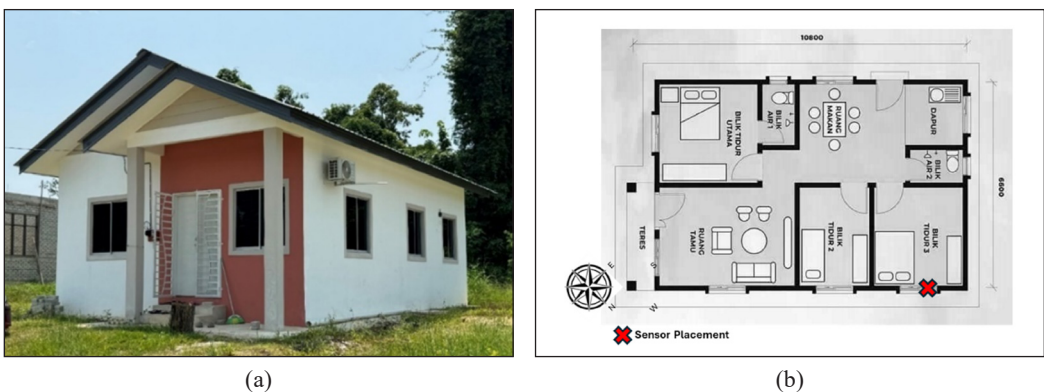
(a) Test house at Pasir Mas, Kelantan; (b) Floor plan of the houses
